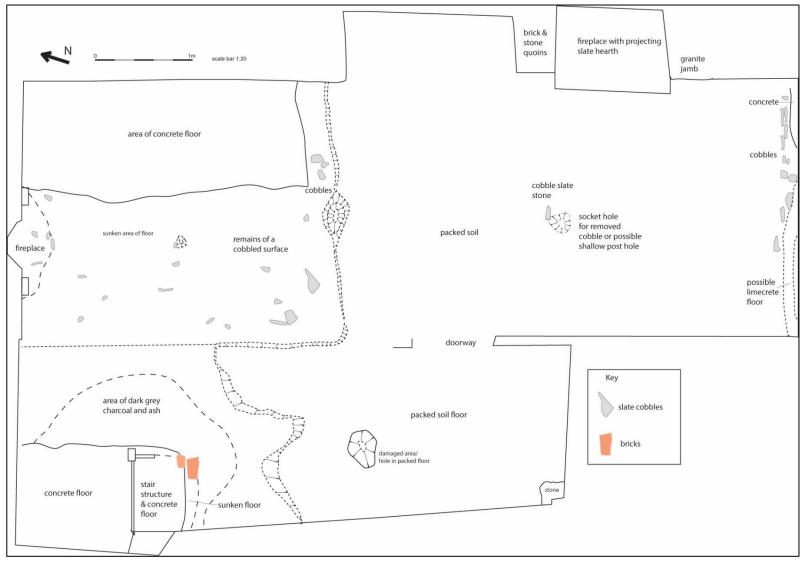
DIGITAL ILLUSTRATION OF SCALED PLAN OF THE EXPOSED FORMER COBBLED FLOOR SURFACE, AS RECORDED.
